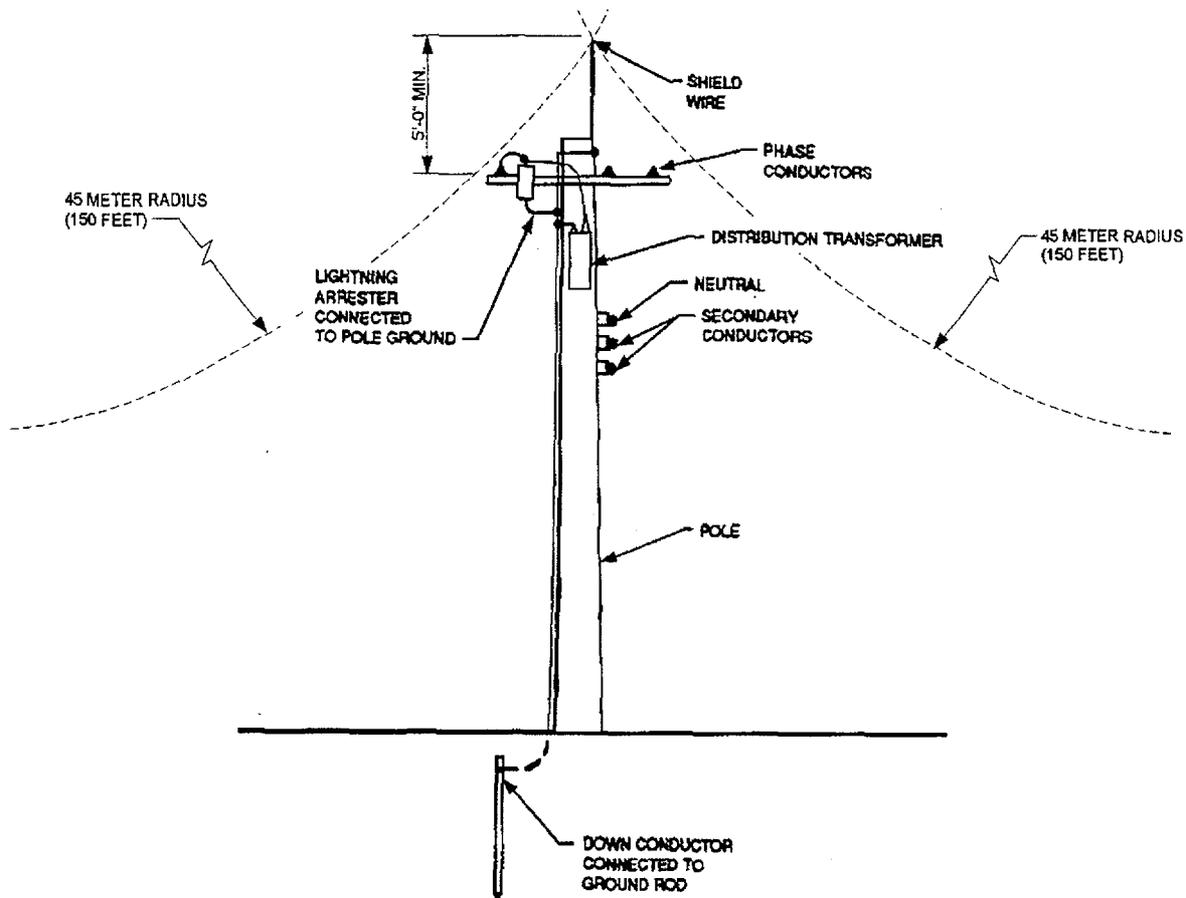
Shield Wire and Lightning Arrester Typical Installation
